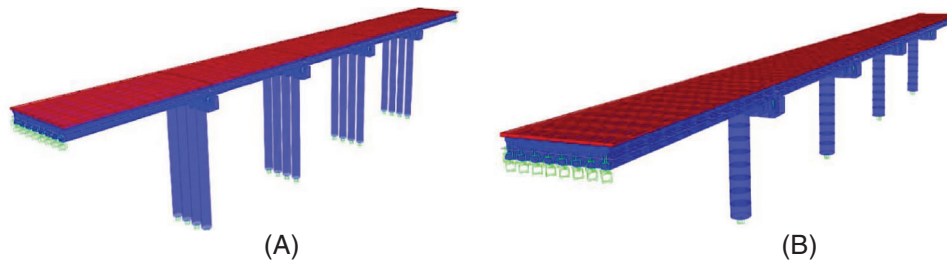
Numerical models of bridges. (A) Multi-column piers and (B) single column piers
